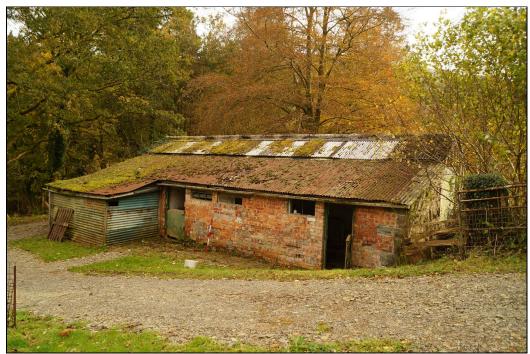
GGN2019_020 - An external view of the building. Looking southeast.
